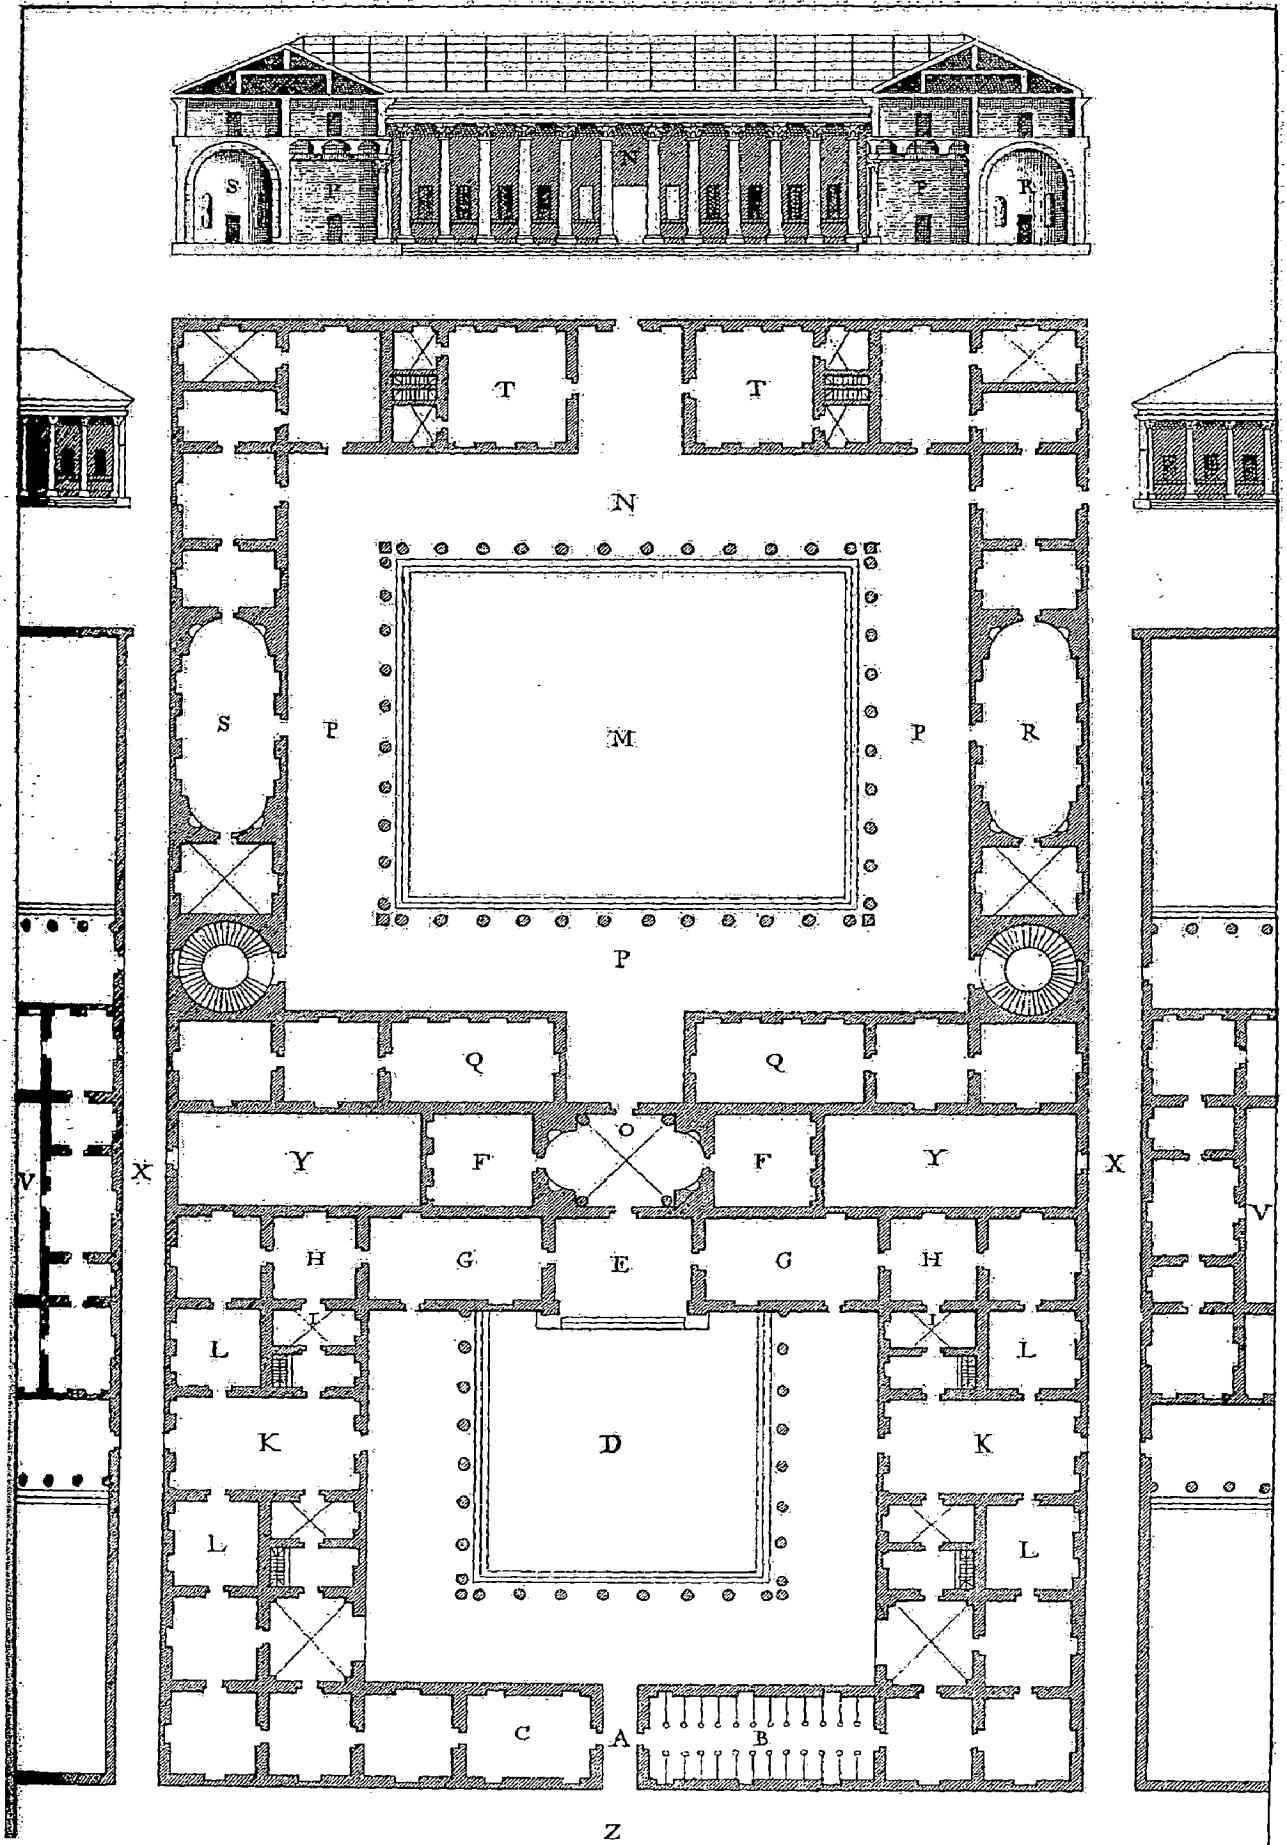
A private house of the ancient Greeks in plan and cross section with adjacent buildings
